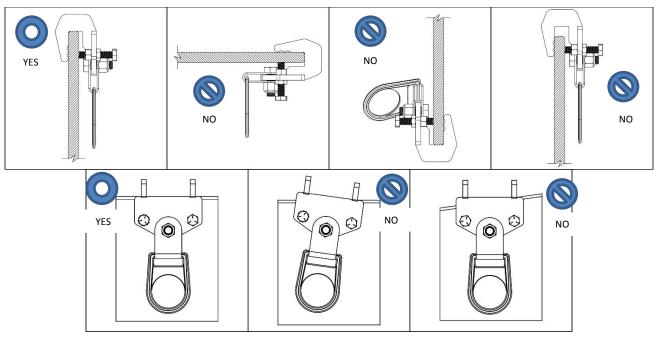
Proper Orientation view of Vertical Steel Plate Anchor
